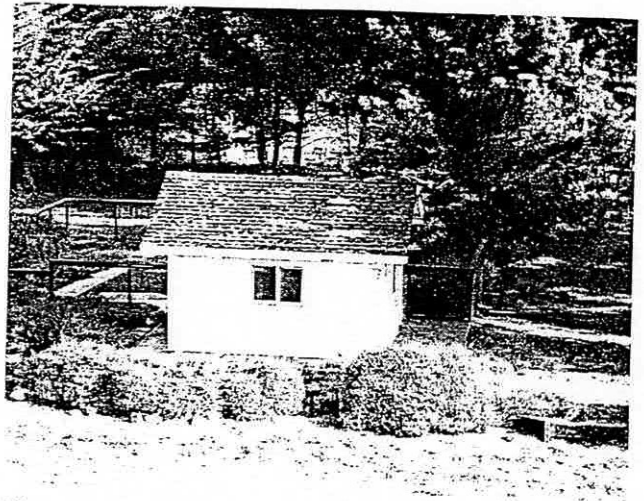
~ Demonstration structure showing stucco clad wall, asphalt comp roof covering, and landscaping vegetation. A through-roof vent on the roof surface is also visible.
